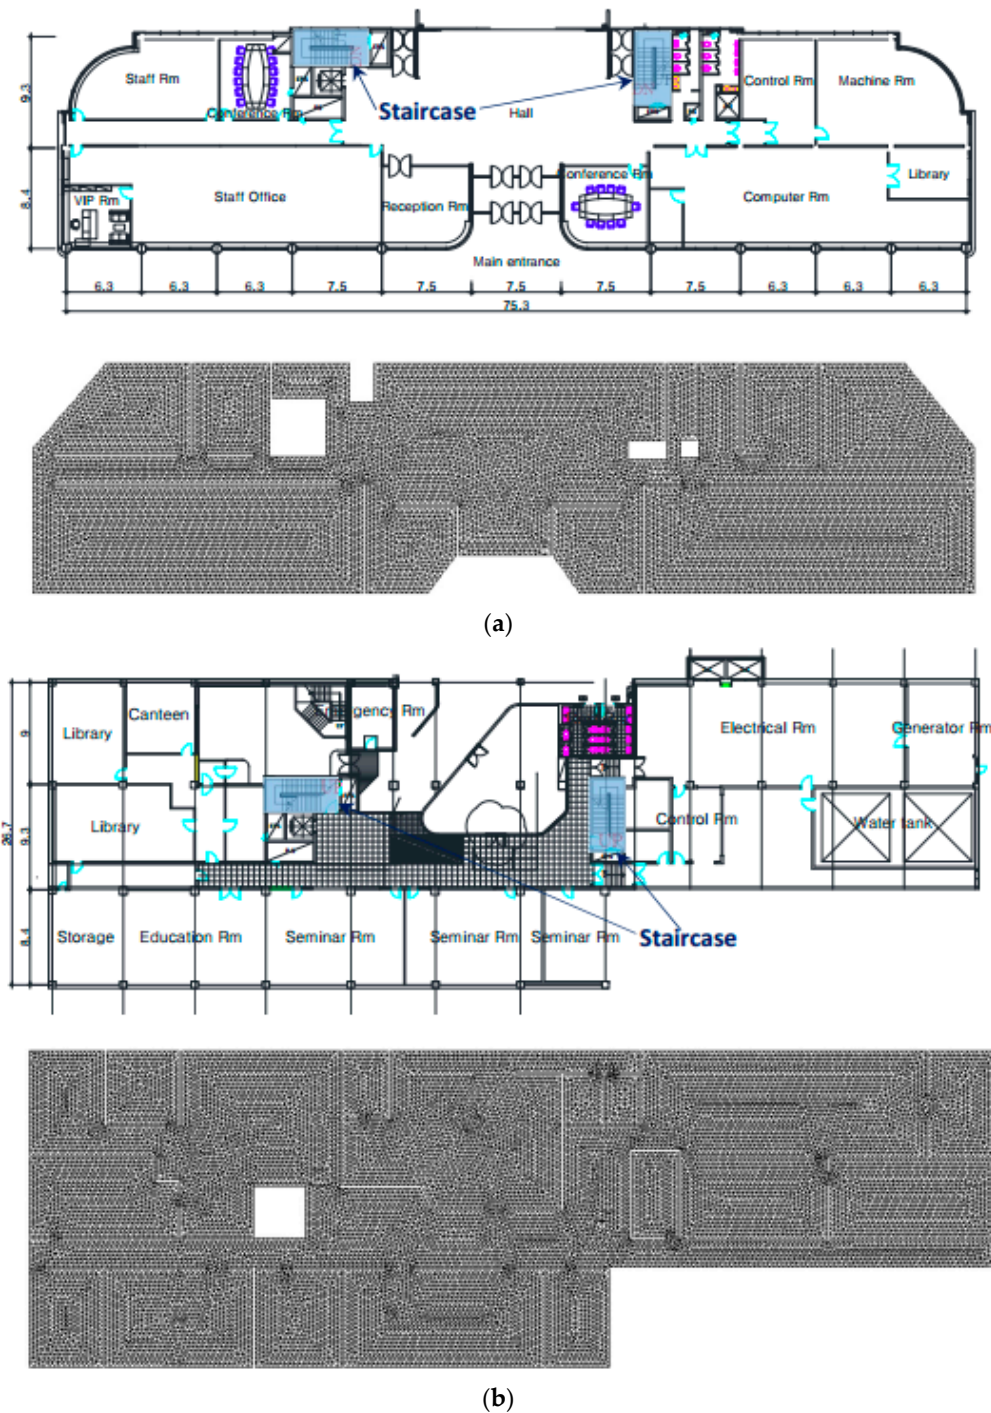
Application site containing two layers: (a) ground floor (above: architectural design plan; below: mesh layout); (b) underground space (above: architectural design plan; below: mesh layout).
